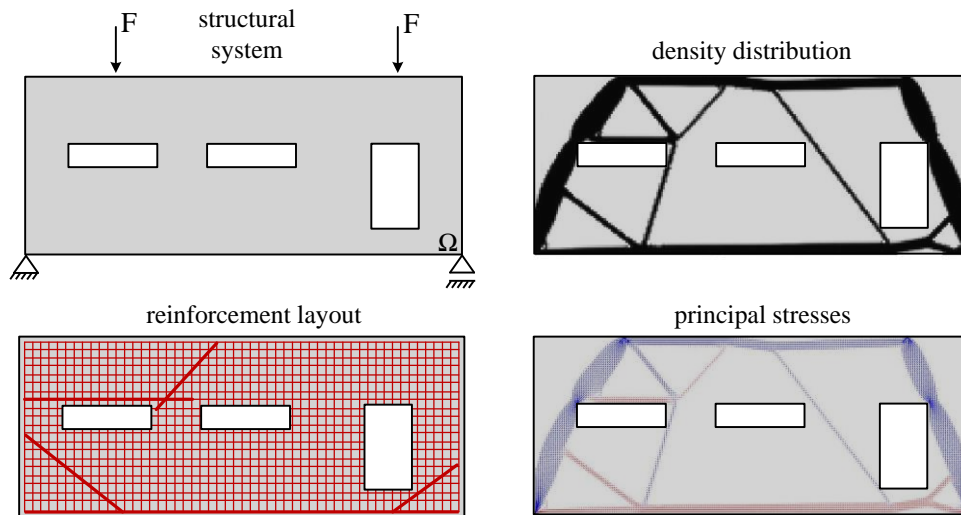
Deep beam with block-outs, loads, densities and a possible reinforcement layout
